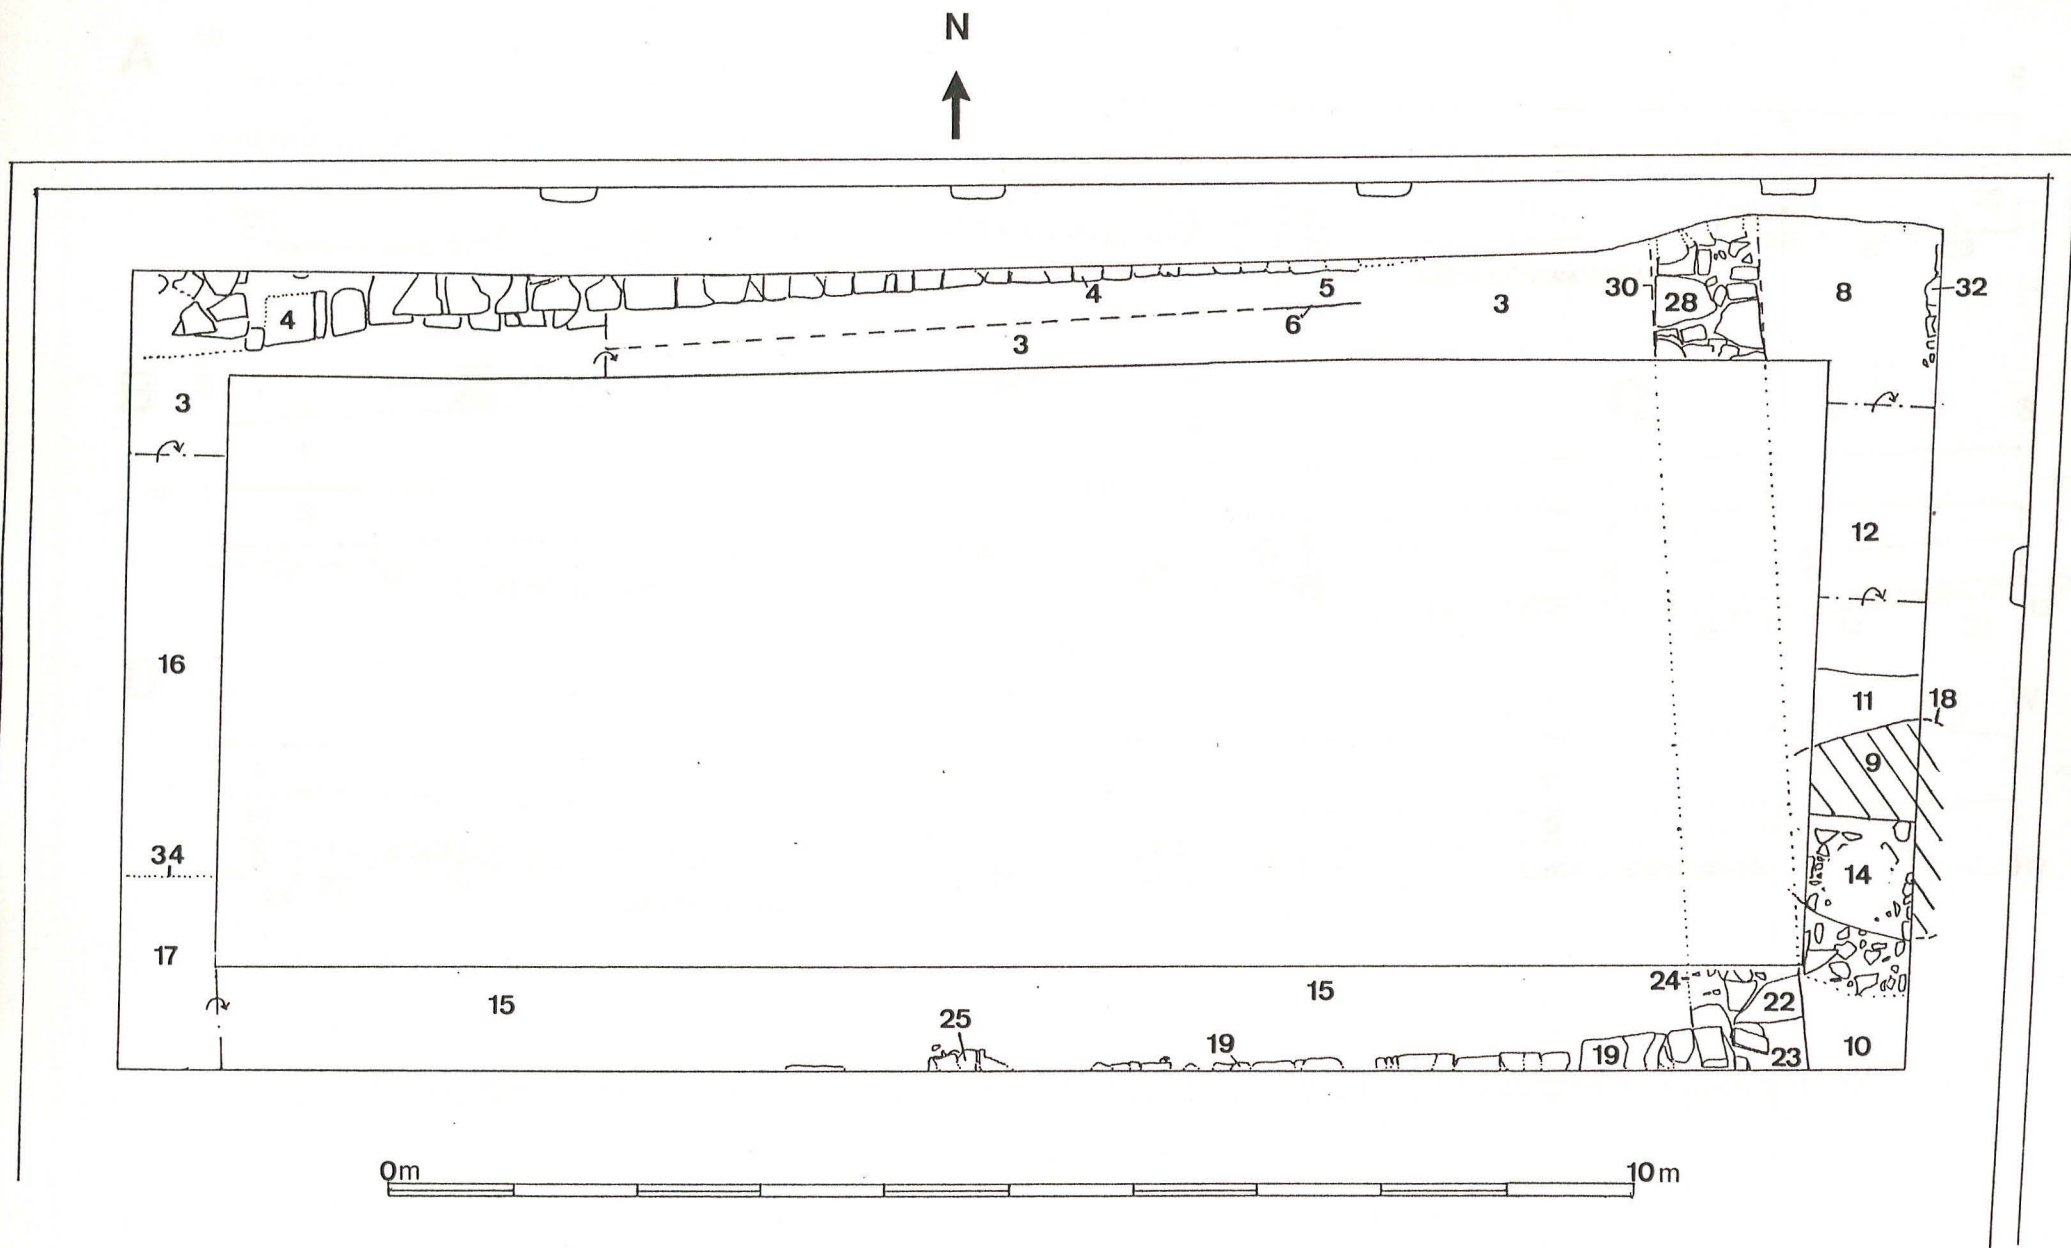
Area 1, Outbuilding foundations plan, showing major archaeological features.
